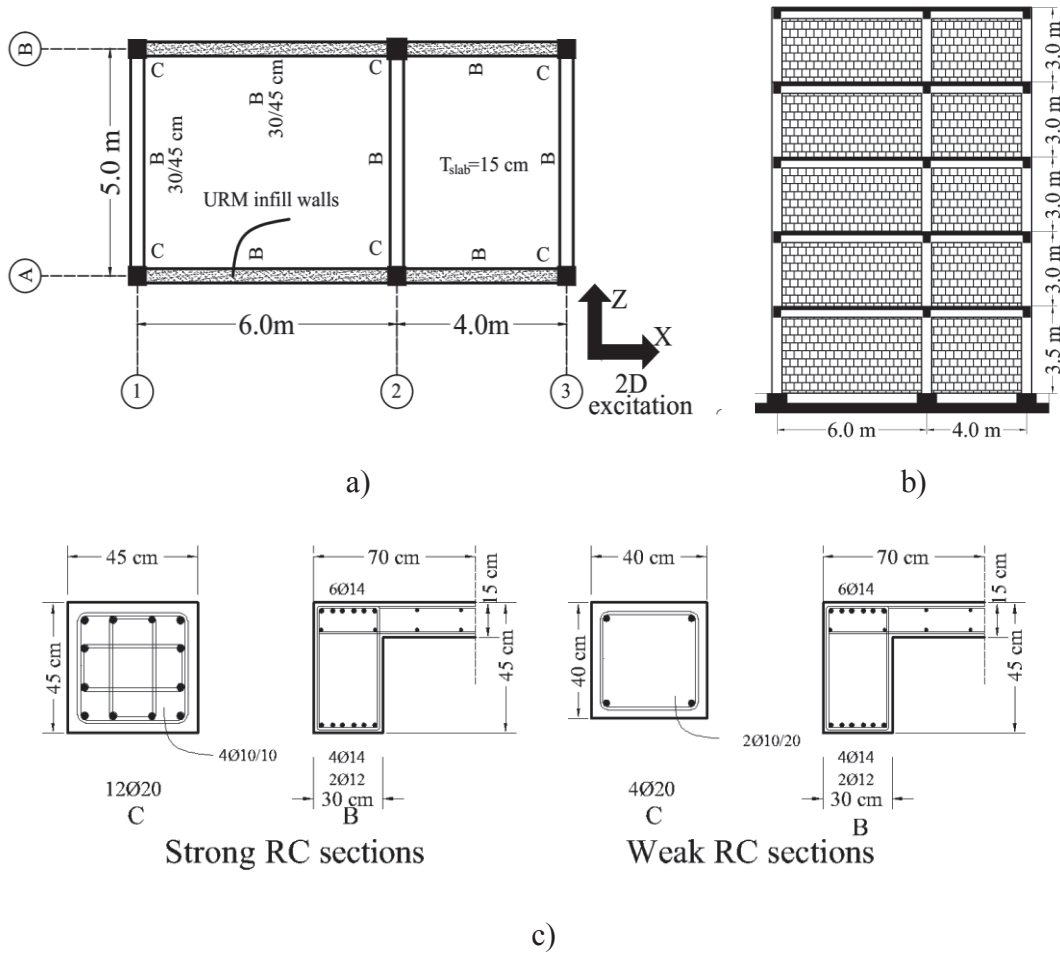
Case study 2 structure: a) plane layout, b) elevation view and c) cross sections
